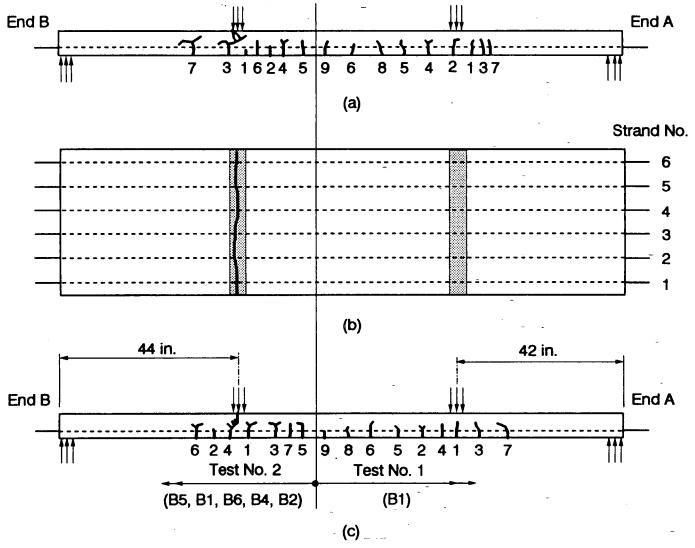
Crack patterns for D-type Specimen No. 15-6.0DU-1:
